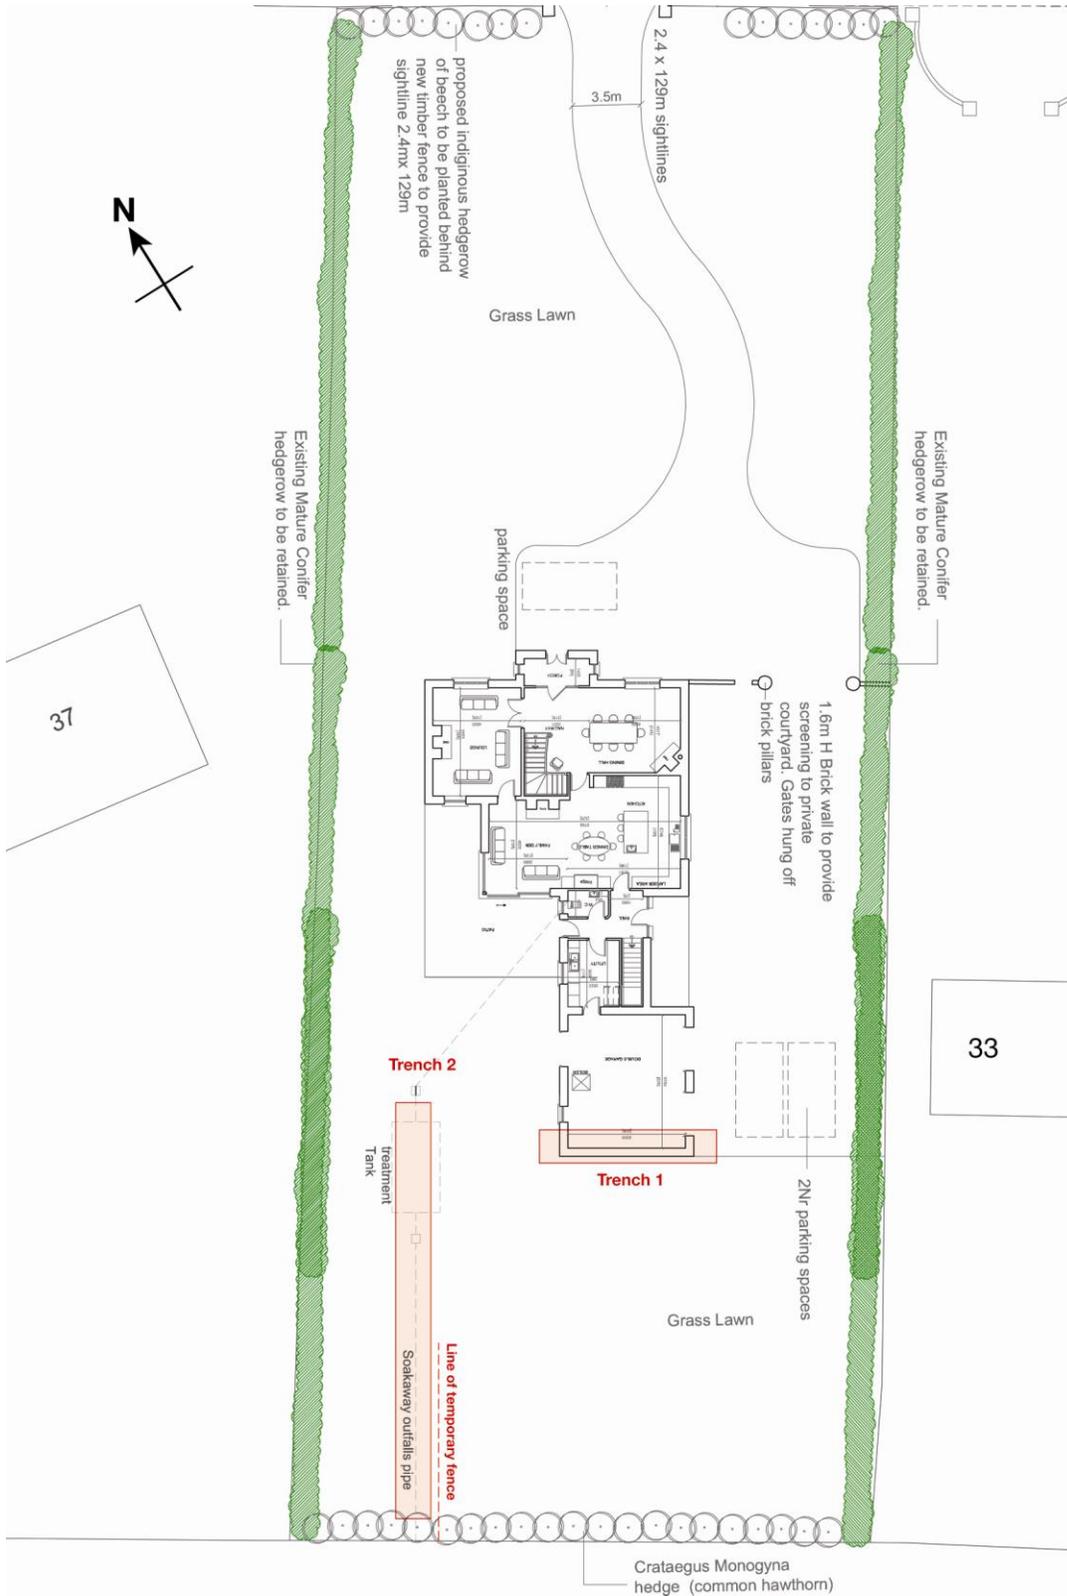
Location map of archaeological trial trenches excavated at a site between 33 and 37 Sheepwalk Road, Ballynadolly, Lisburn, County Antrim.
